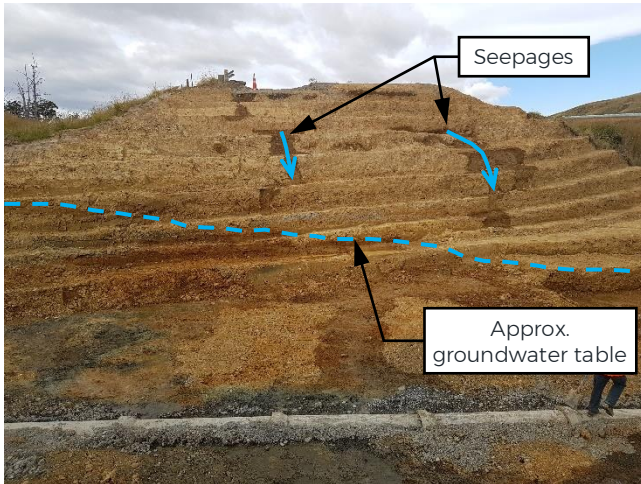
Post-earthquake excavation of the embankment at Culvert 55
